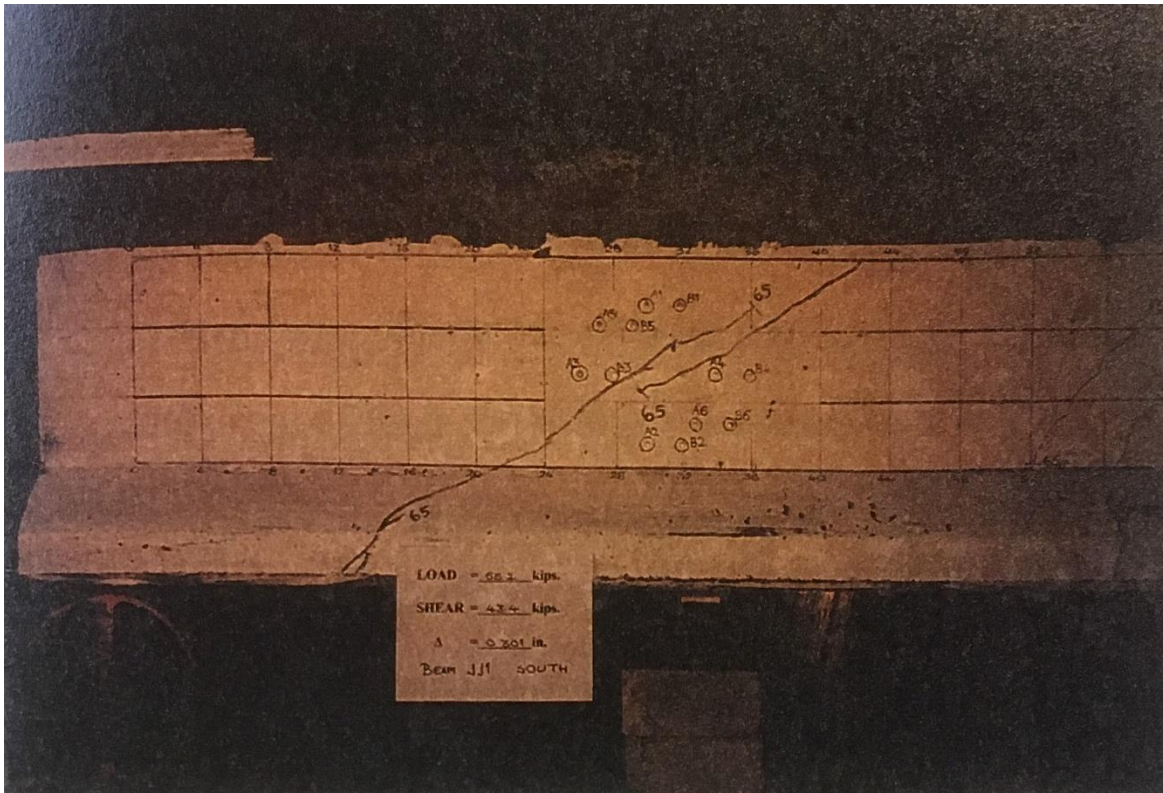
Photo of South End of Beam JJ1 Showing First Web Shear Cracking from Jacob (1998)
